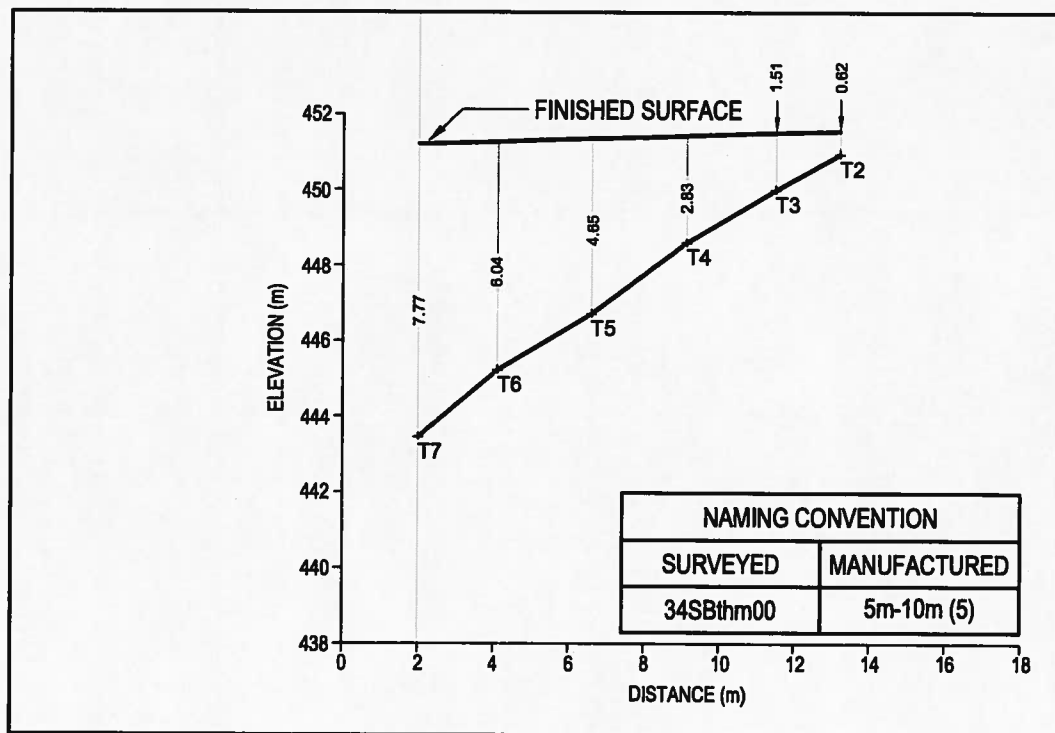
34SBthm00 (5m-10m (5)) - AS MANUFACTURED, PLAN, AND SECTION
